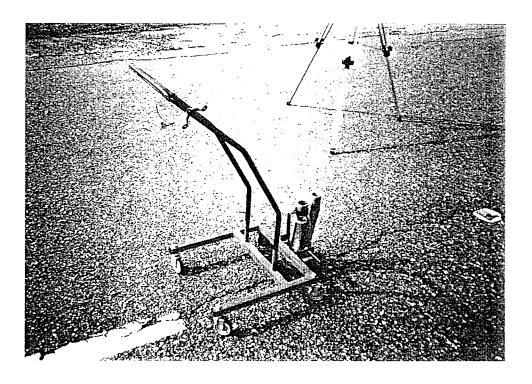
LTC Abrasive Vacuum Blast Cart and Blast Head
